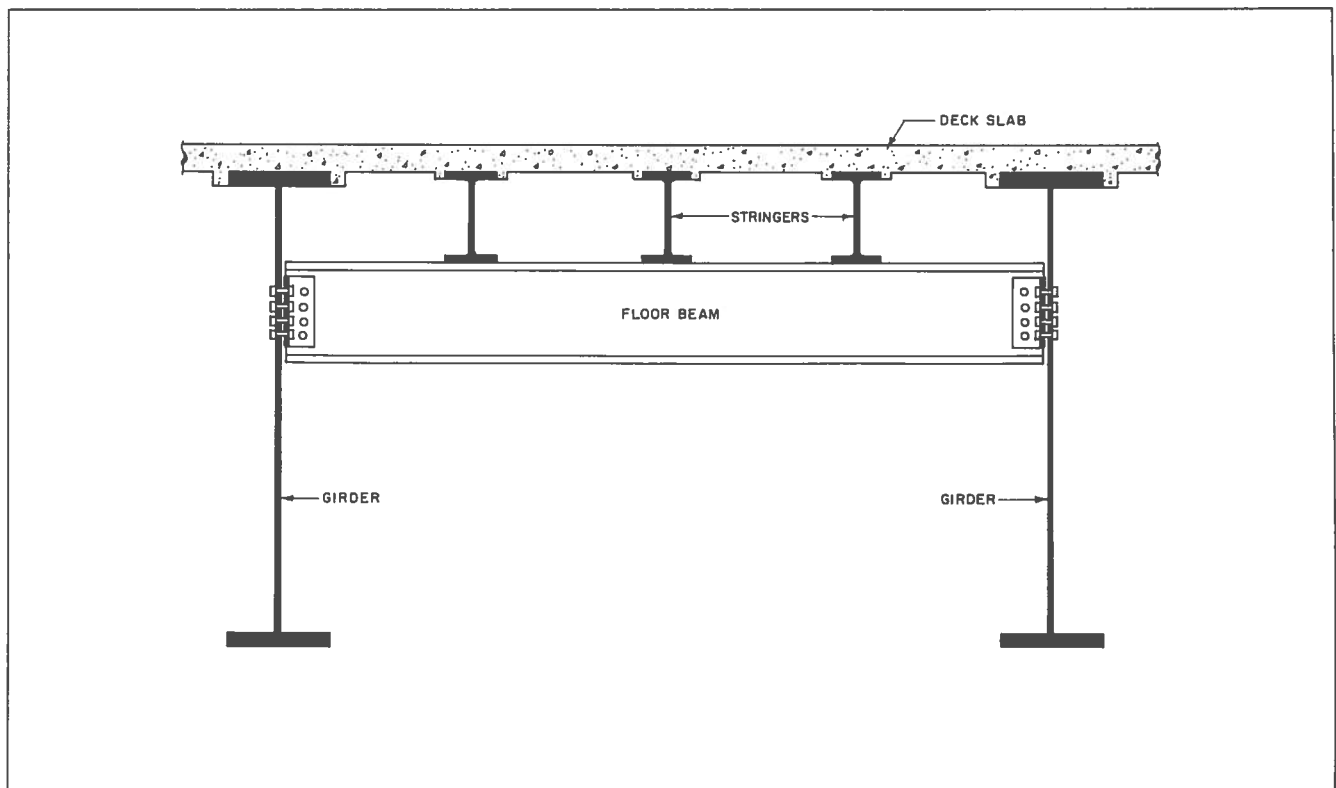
Cross-section for plate girder bridge with floor beams and stringers.
